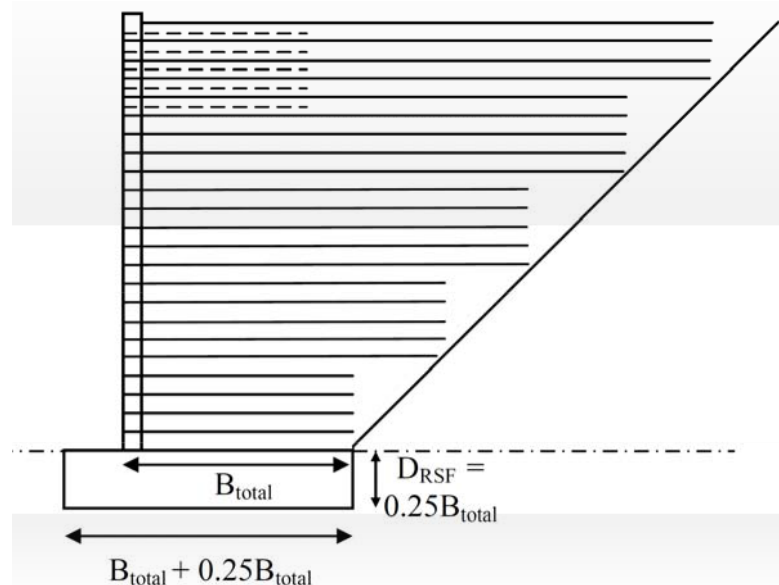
Reinforced soil foundation (RSF) dimensions
